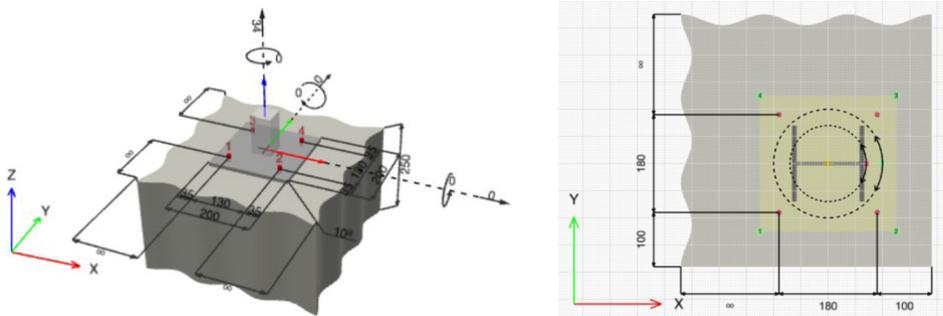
Baseplate connection using post-installed concrete screw anchors
